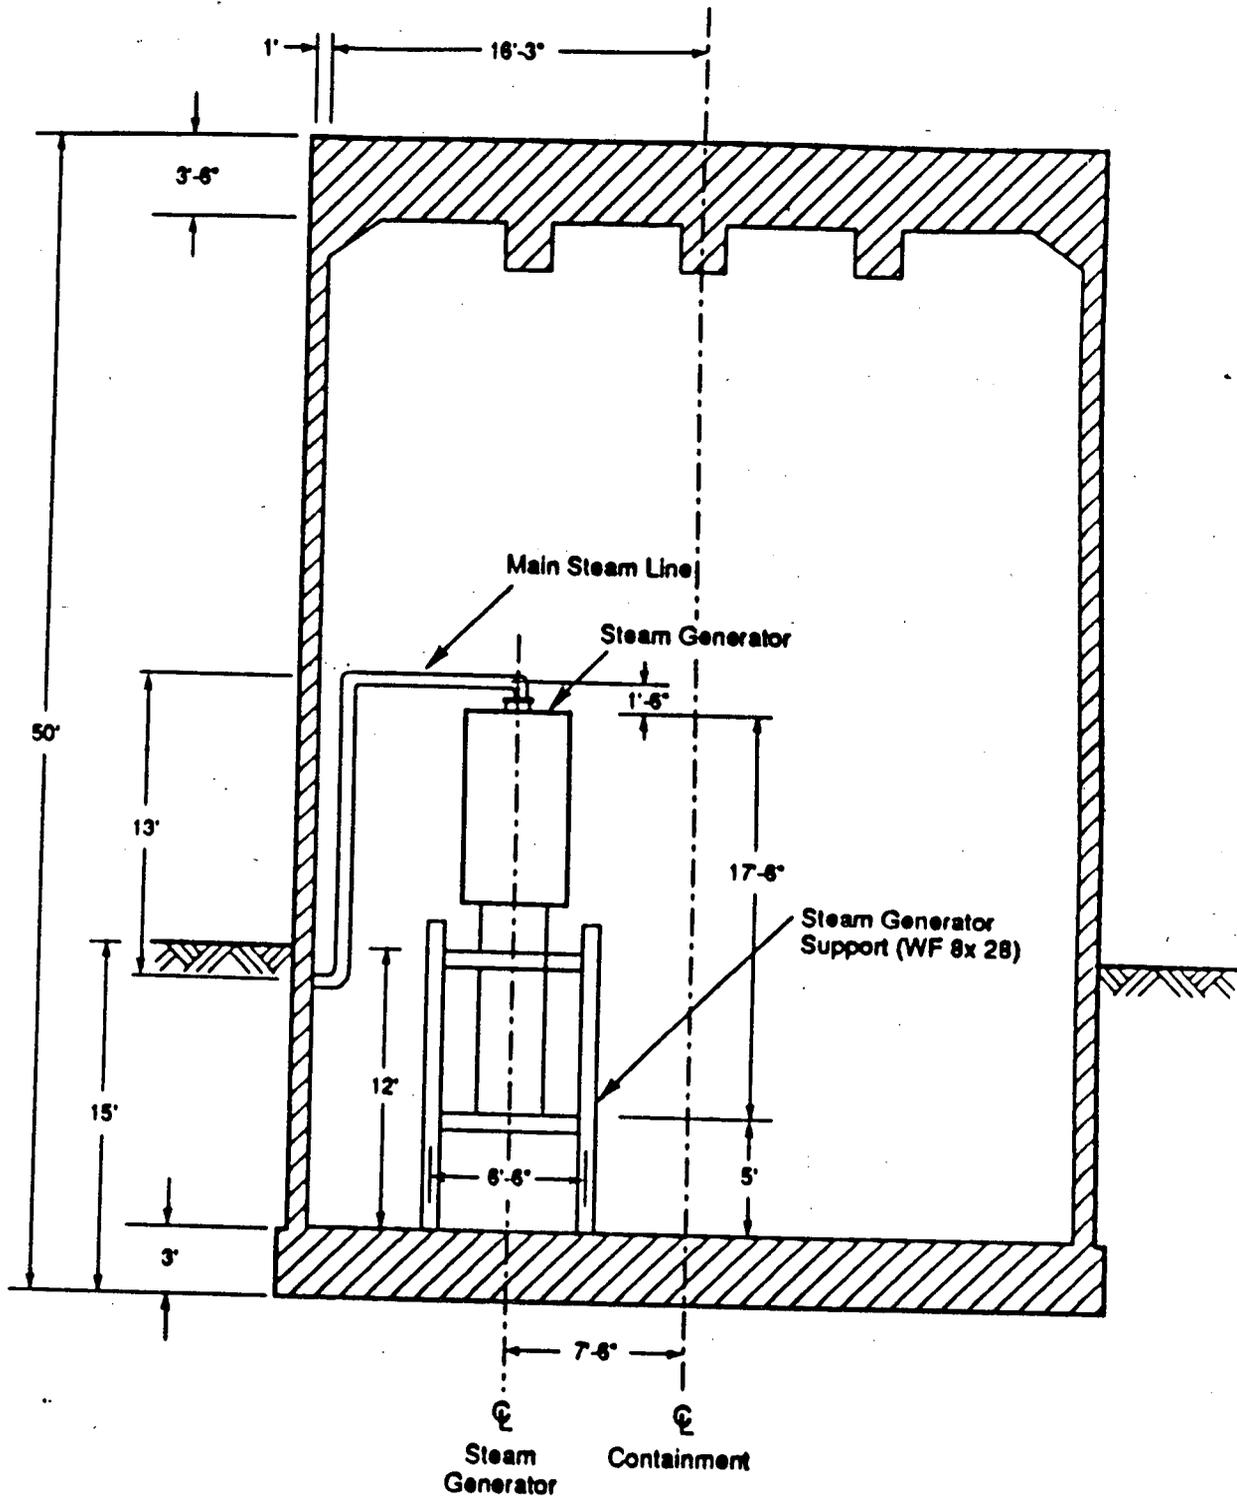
vertical Cross Section of the 1/4-Scale Containment Model Located in Lotung, Taiwan (Ref. 7)
